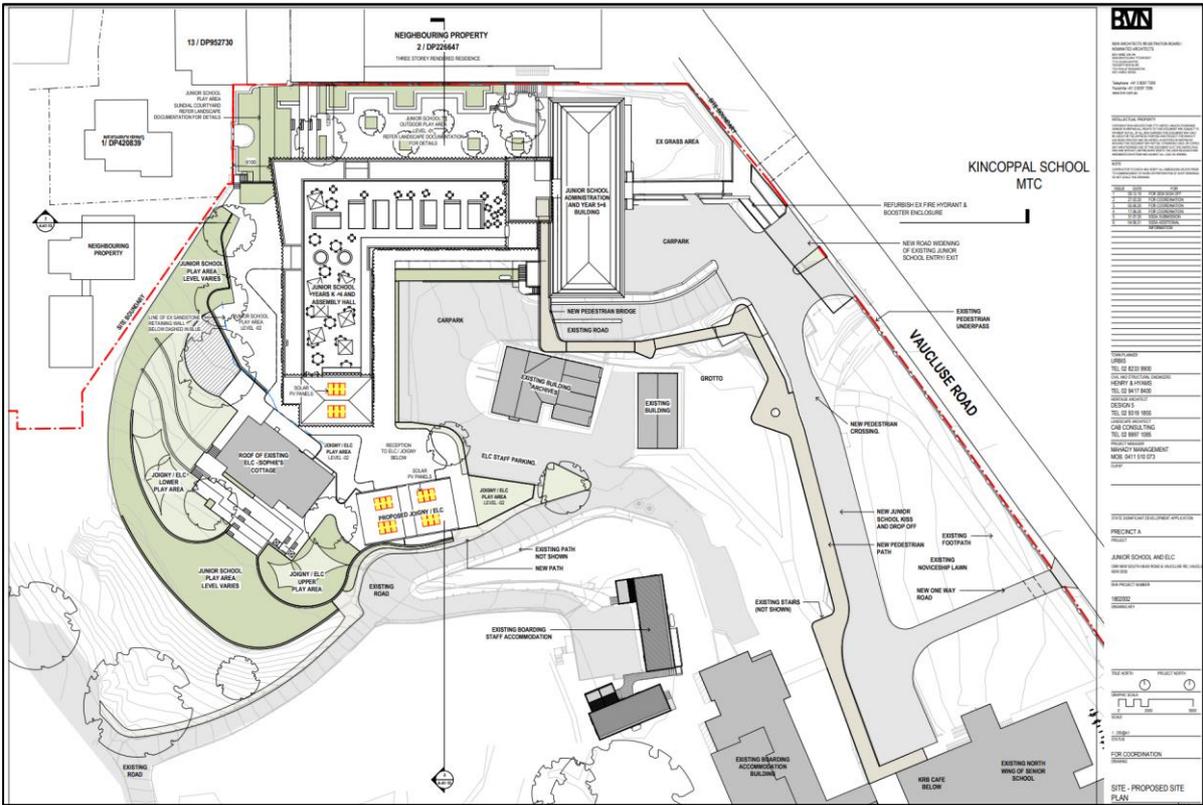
| Precinct A site plan (Source: Applicant's RtS 2021)
